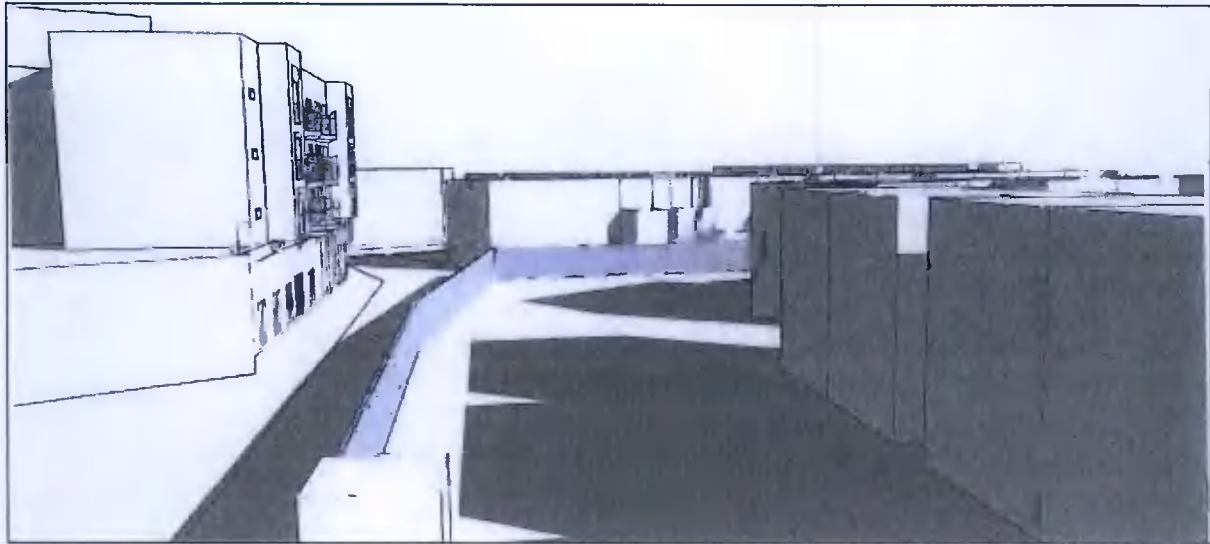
3D Study looking northeast and from laneway toward Wheatfield Road.
